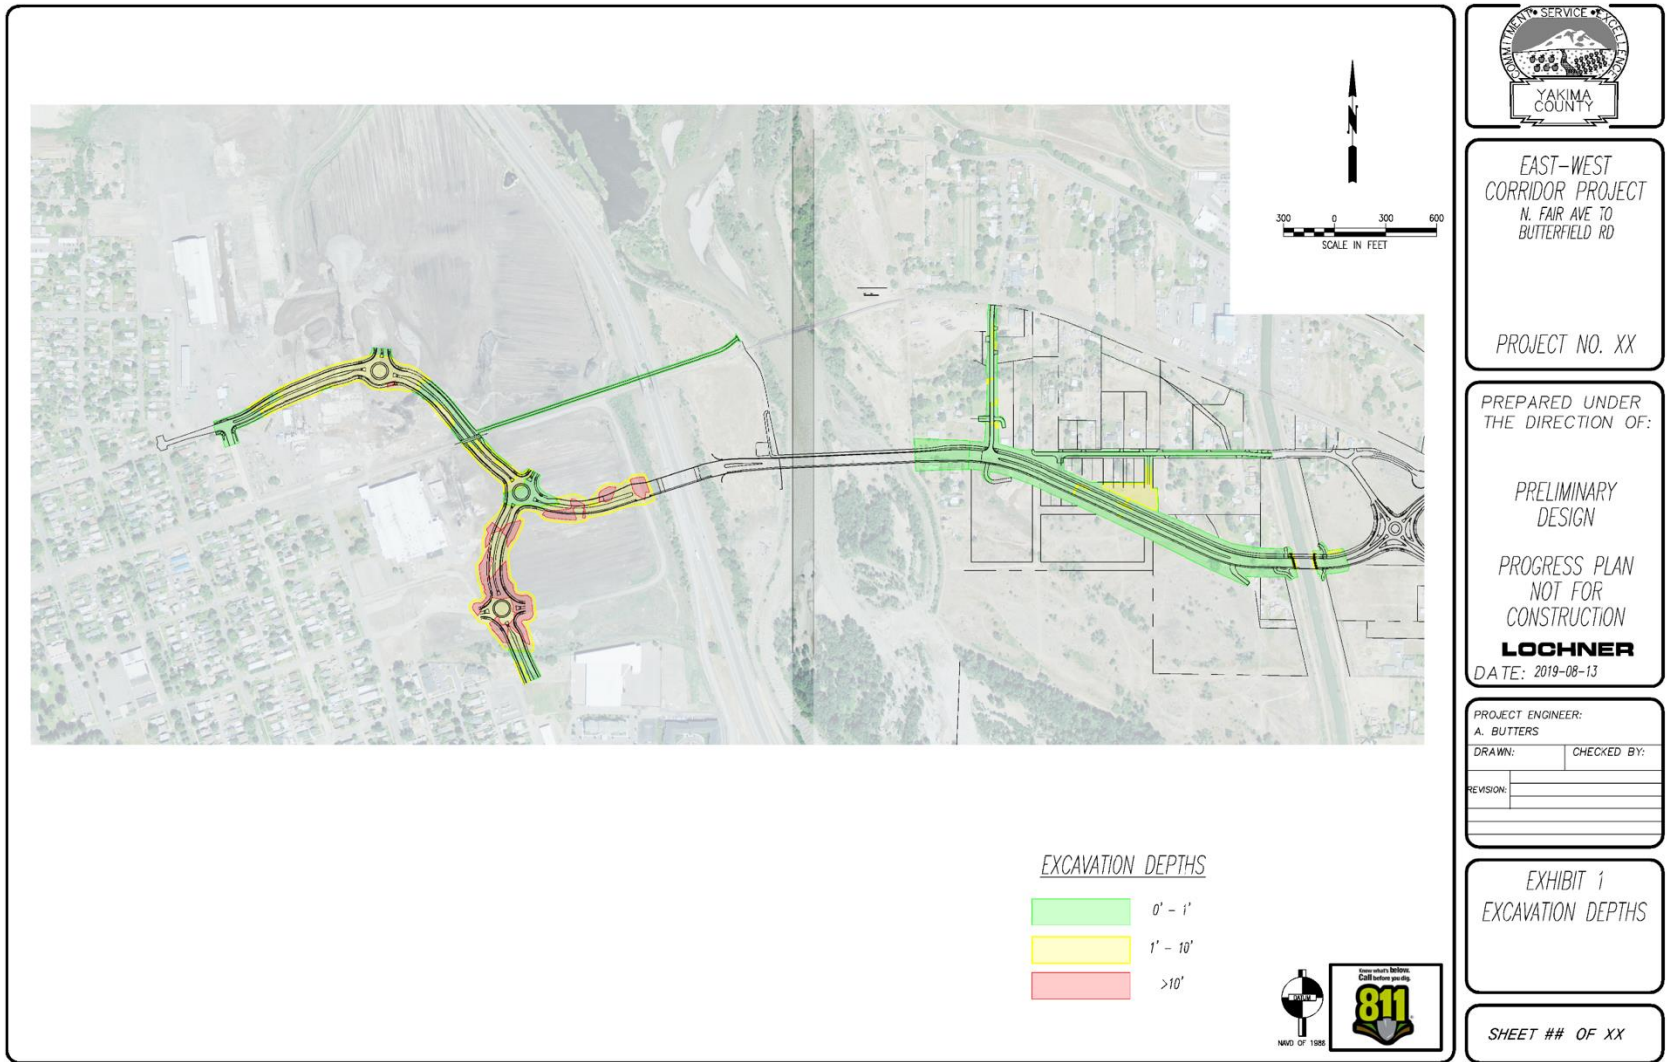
Detail of proposed depth of construction throughout the footprint of construction for the Yakima East-West Corridor Project (courtesy of Widener and Associates).
